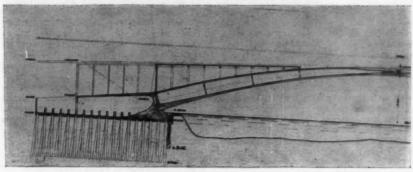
San Niccola Bridge, Florence: Half-longitudinal Section.
